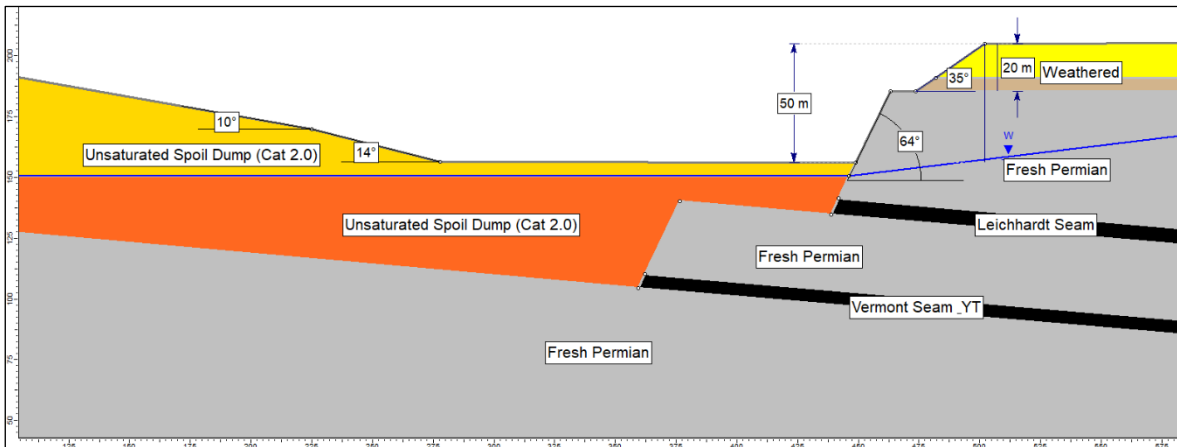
Southern Void (Low wall and Highwall) – Section 2 (North Facing)
